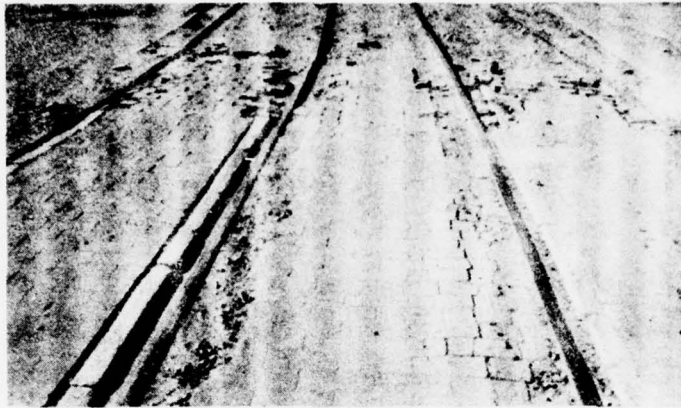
Bridge 24. West End of Bridge. Streetcar Rails Moved Laterally 15 Inches to the North When Blast Effects Shifted Bridge Deck (1,000 Feet to Gz, 2,230 Feet to Az).
